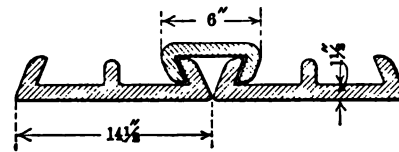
EWARTS' CAST-IRON SHEET-PILING.
